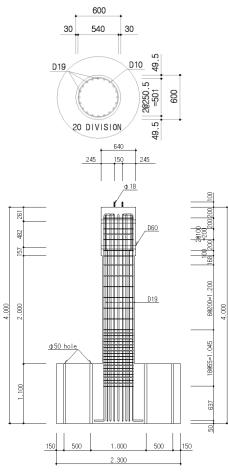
Bridge column geometry and reinforcement (Unit: mm)
